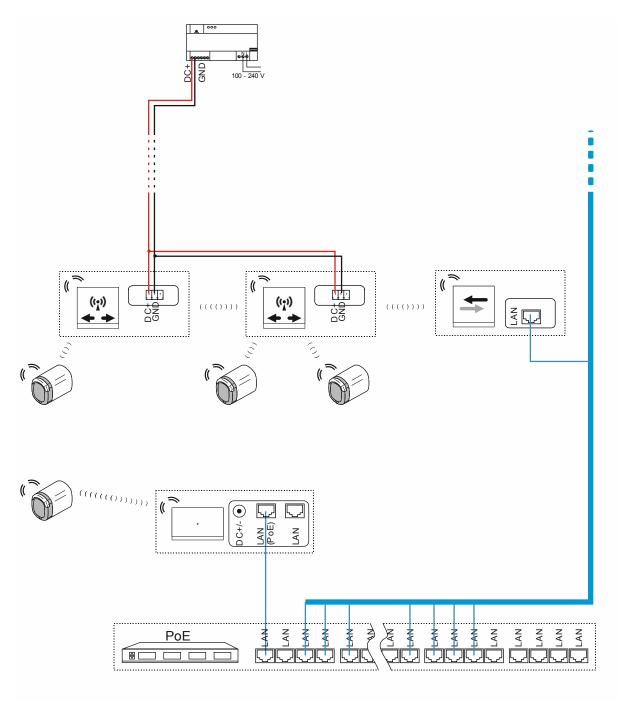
Connection: Multi-floor residential building with more than 10 meters transmission route
